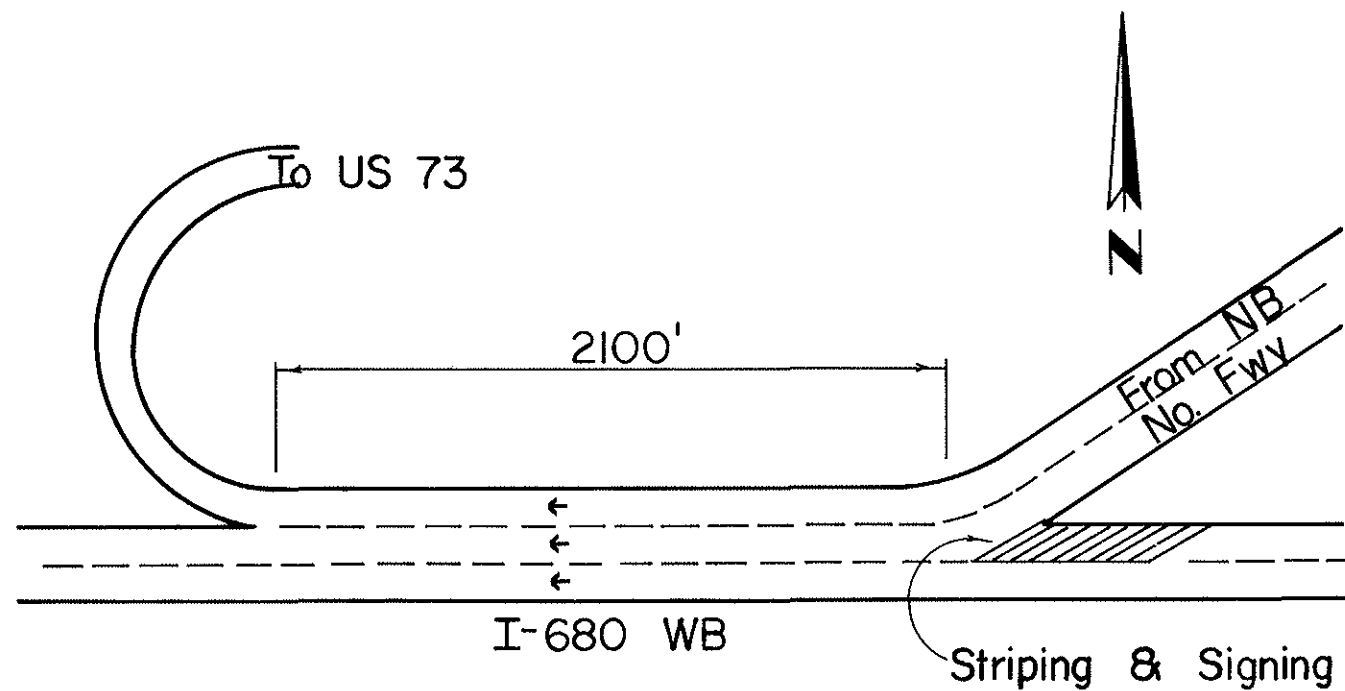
Weaving Section, North Freeway Ramp, To US 73 Ramp, East Alignment
